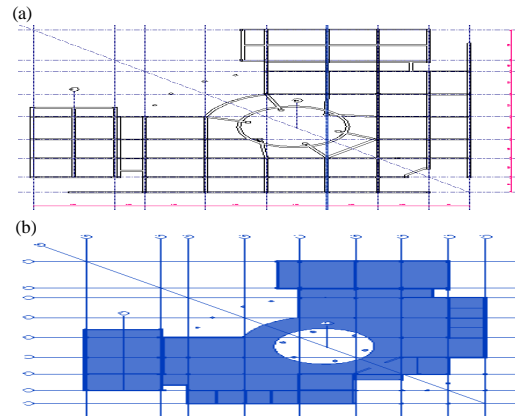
a, b) The beams and slabs of the first floor of case study 1 using BIM
